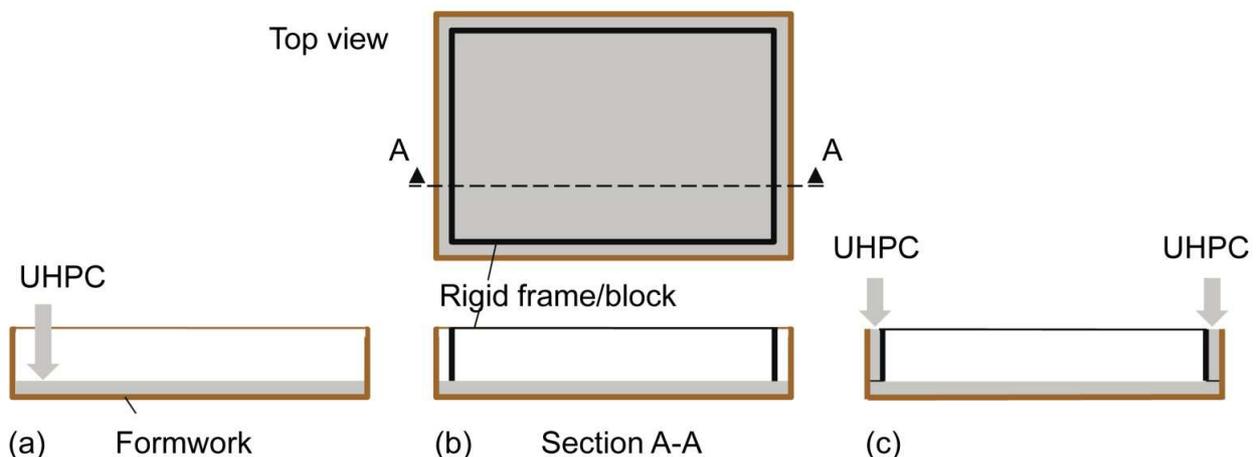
Procedure for two-step production of box-shaped UHPC elements: (a) cast of exterior layer; (b) placement of a rigid frame as internal formwork on hardened exterior layer; (c) cast of upturning edges.
